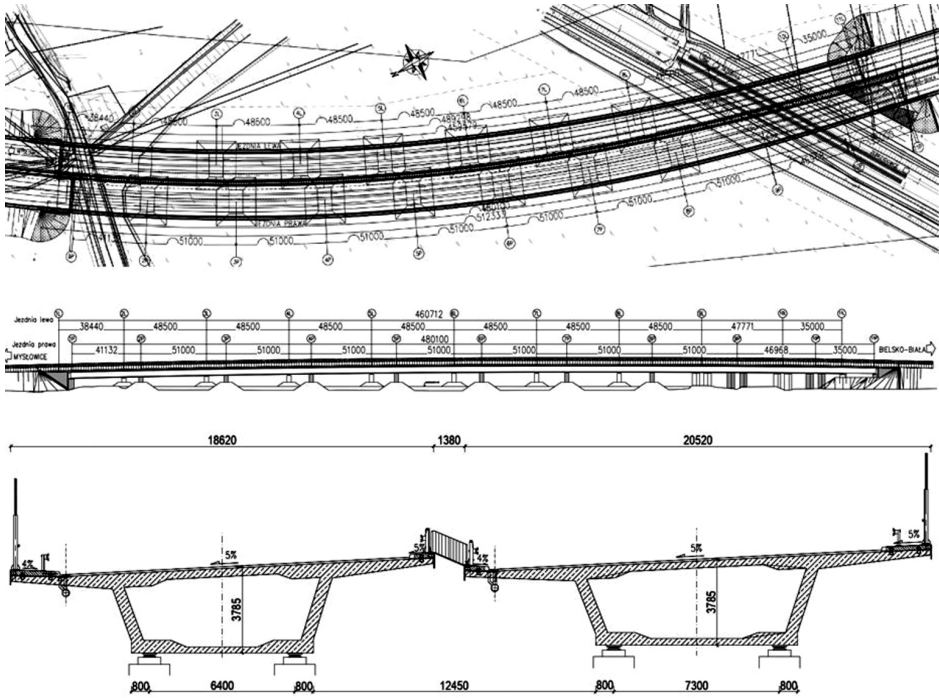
General construction scheme: from the top: location of the bridge in the plan; side view; typical cross sections [30]
